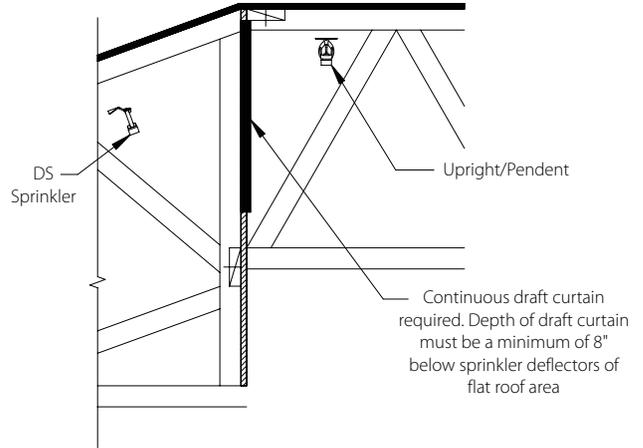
B: SLOPE TO FLAT TRANSITION WITH FLAT ROOF AT THE SAME ELEVATION AS PEAK OF SLOPED ROOF
